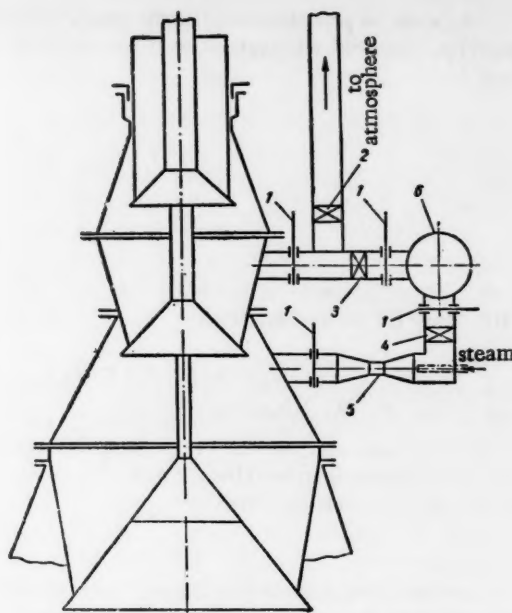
Schematic design of the gas pipes and regulating valves. 1) Slide plates for blocking off valves during repairs; 2) exhaust valve; 3) intake valve for the upper interbell space; 4) intake valve for the lower interbell space; 5) steam injector; 6) pipe for partially cleaned gas from the high-pressure scrubber.
